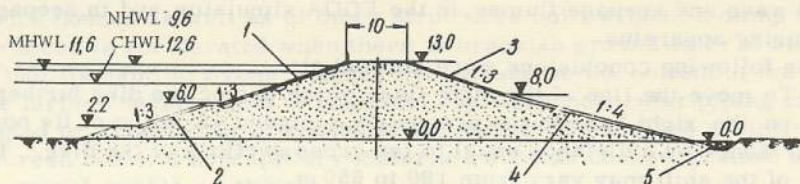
Recommended cross section of a hydraulic-fill dike in the flood plain of the Orel' River
